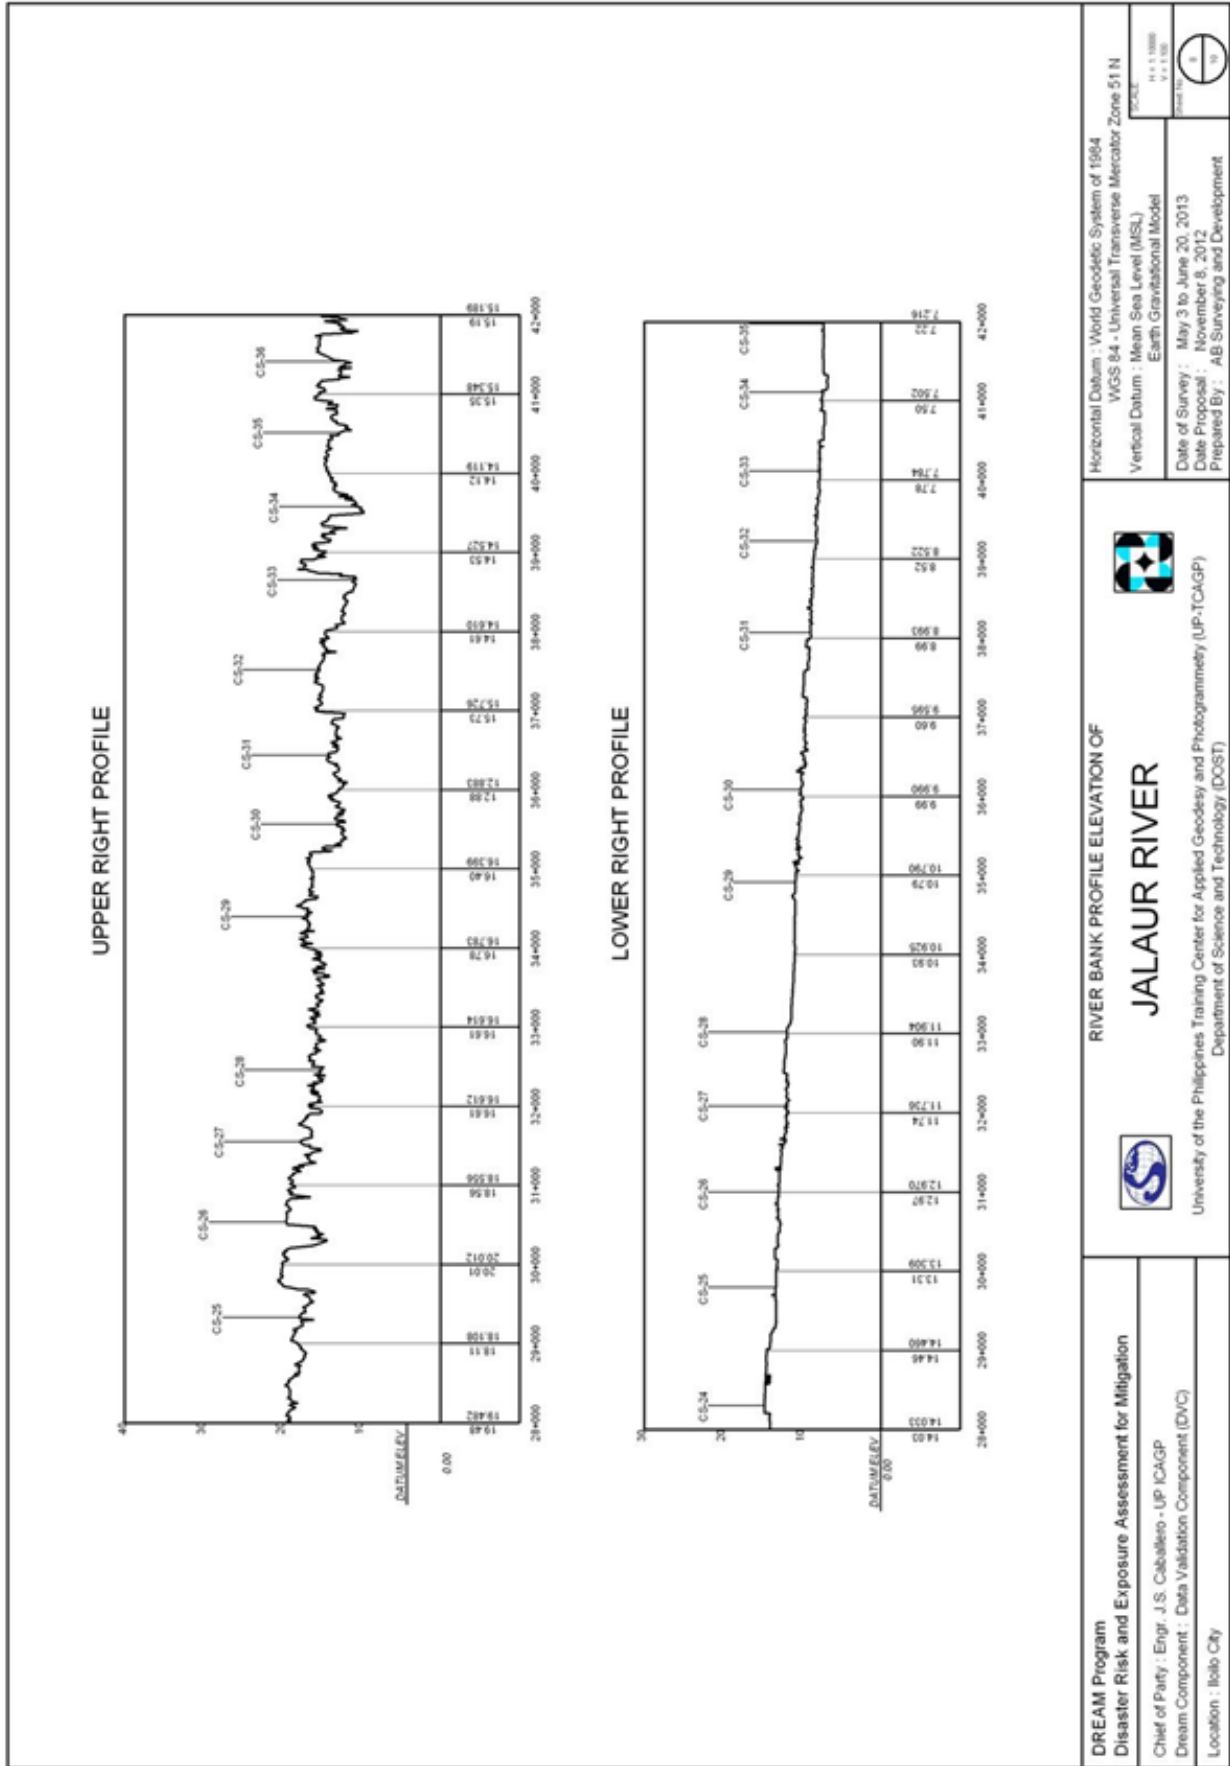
Sheet No. 8 Right River bank profile with relative location of bridge and cross-section
